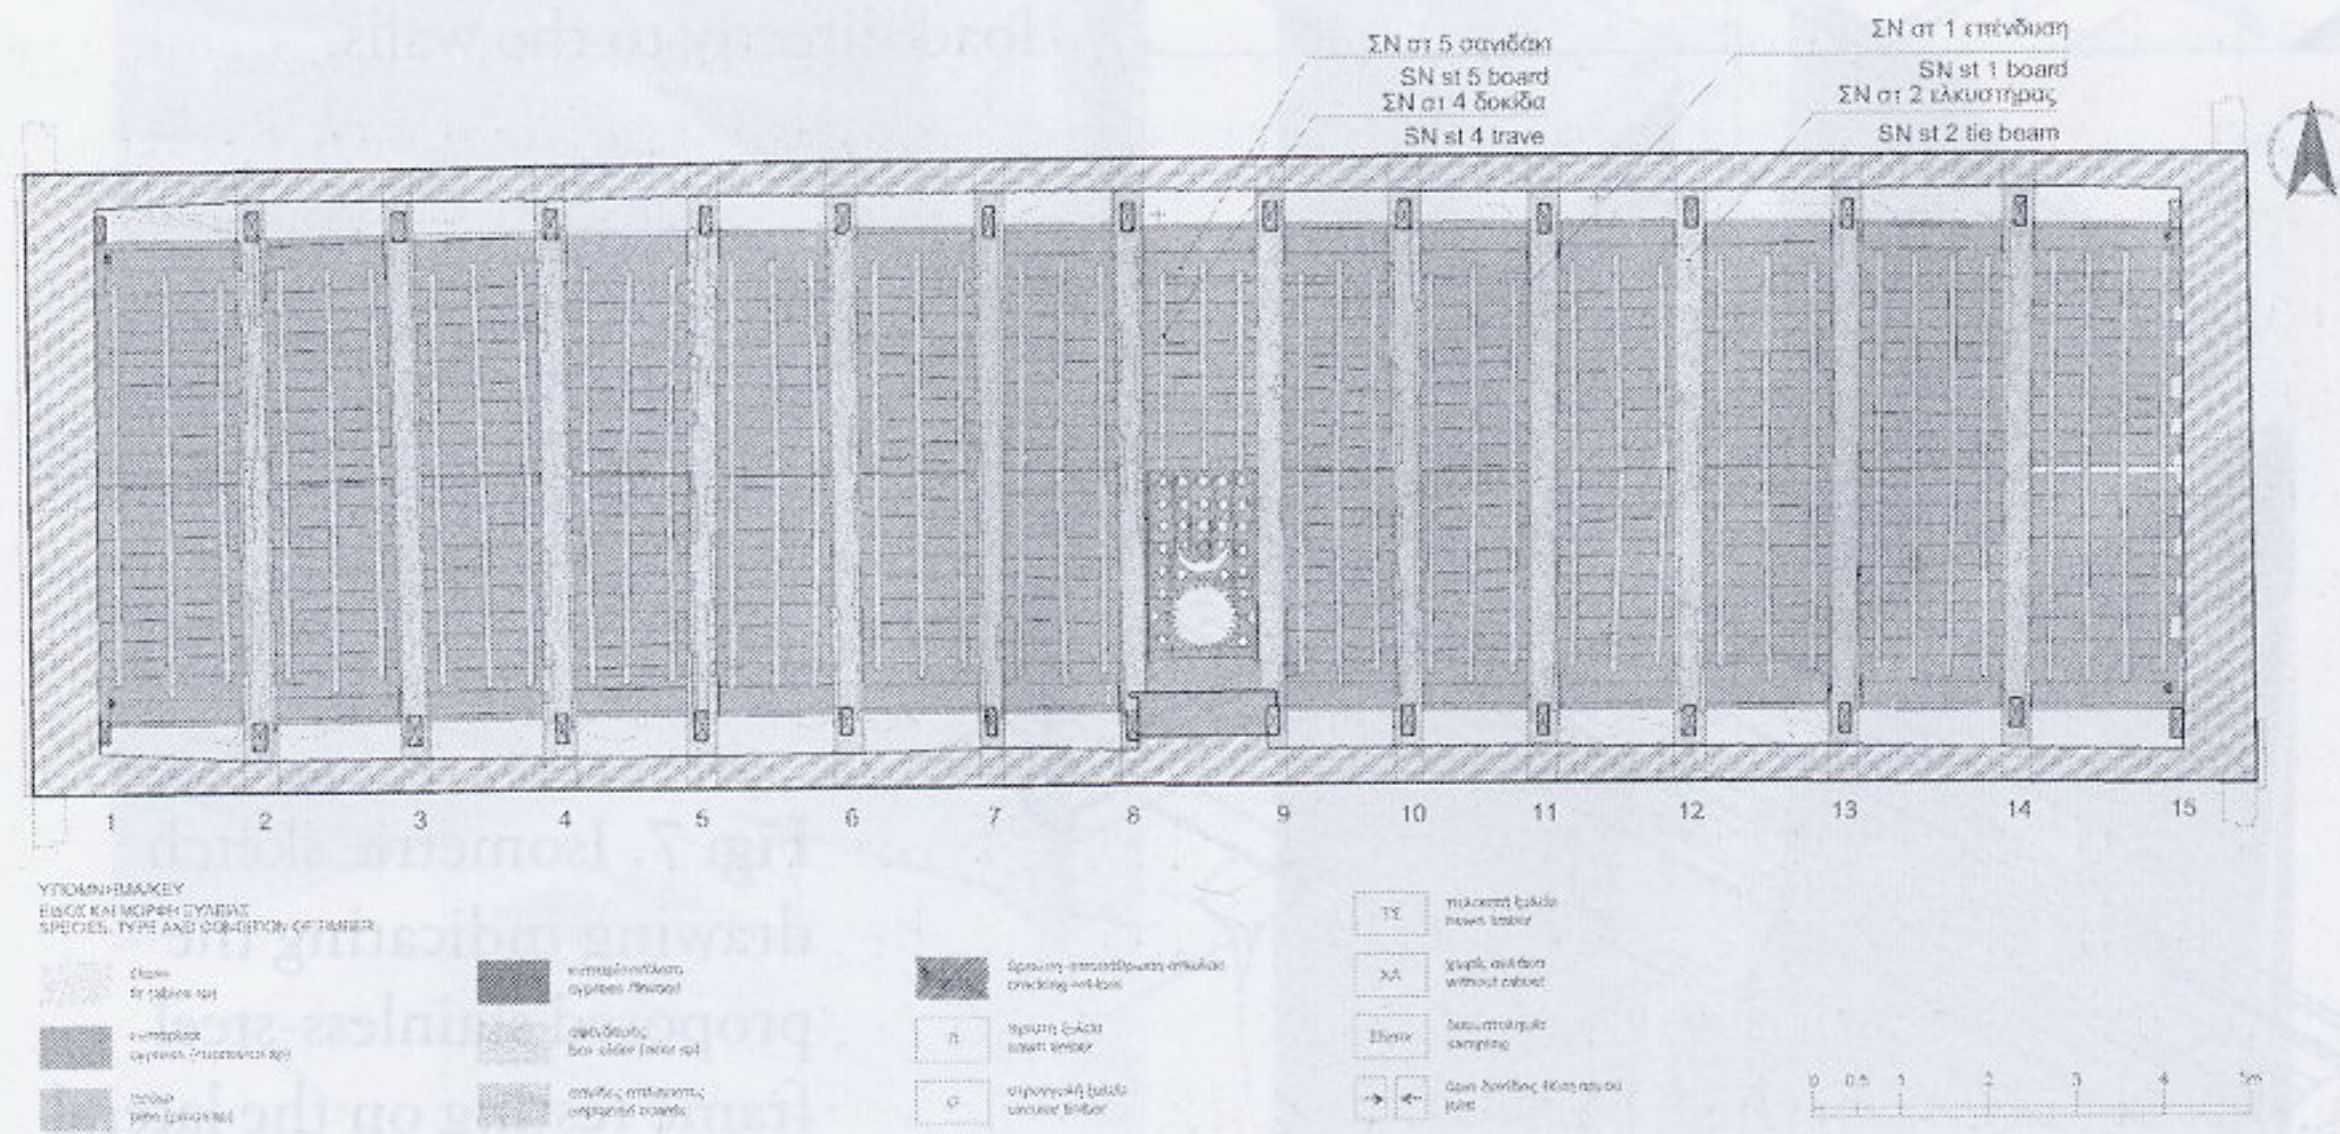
Plan of the 6th century tie-beams (fir) of the raised central nave and the 18th century wooden ceiling (pine) underneath.
